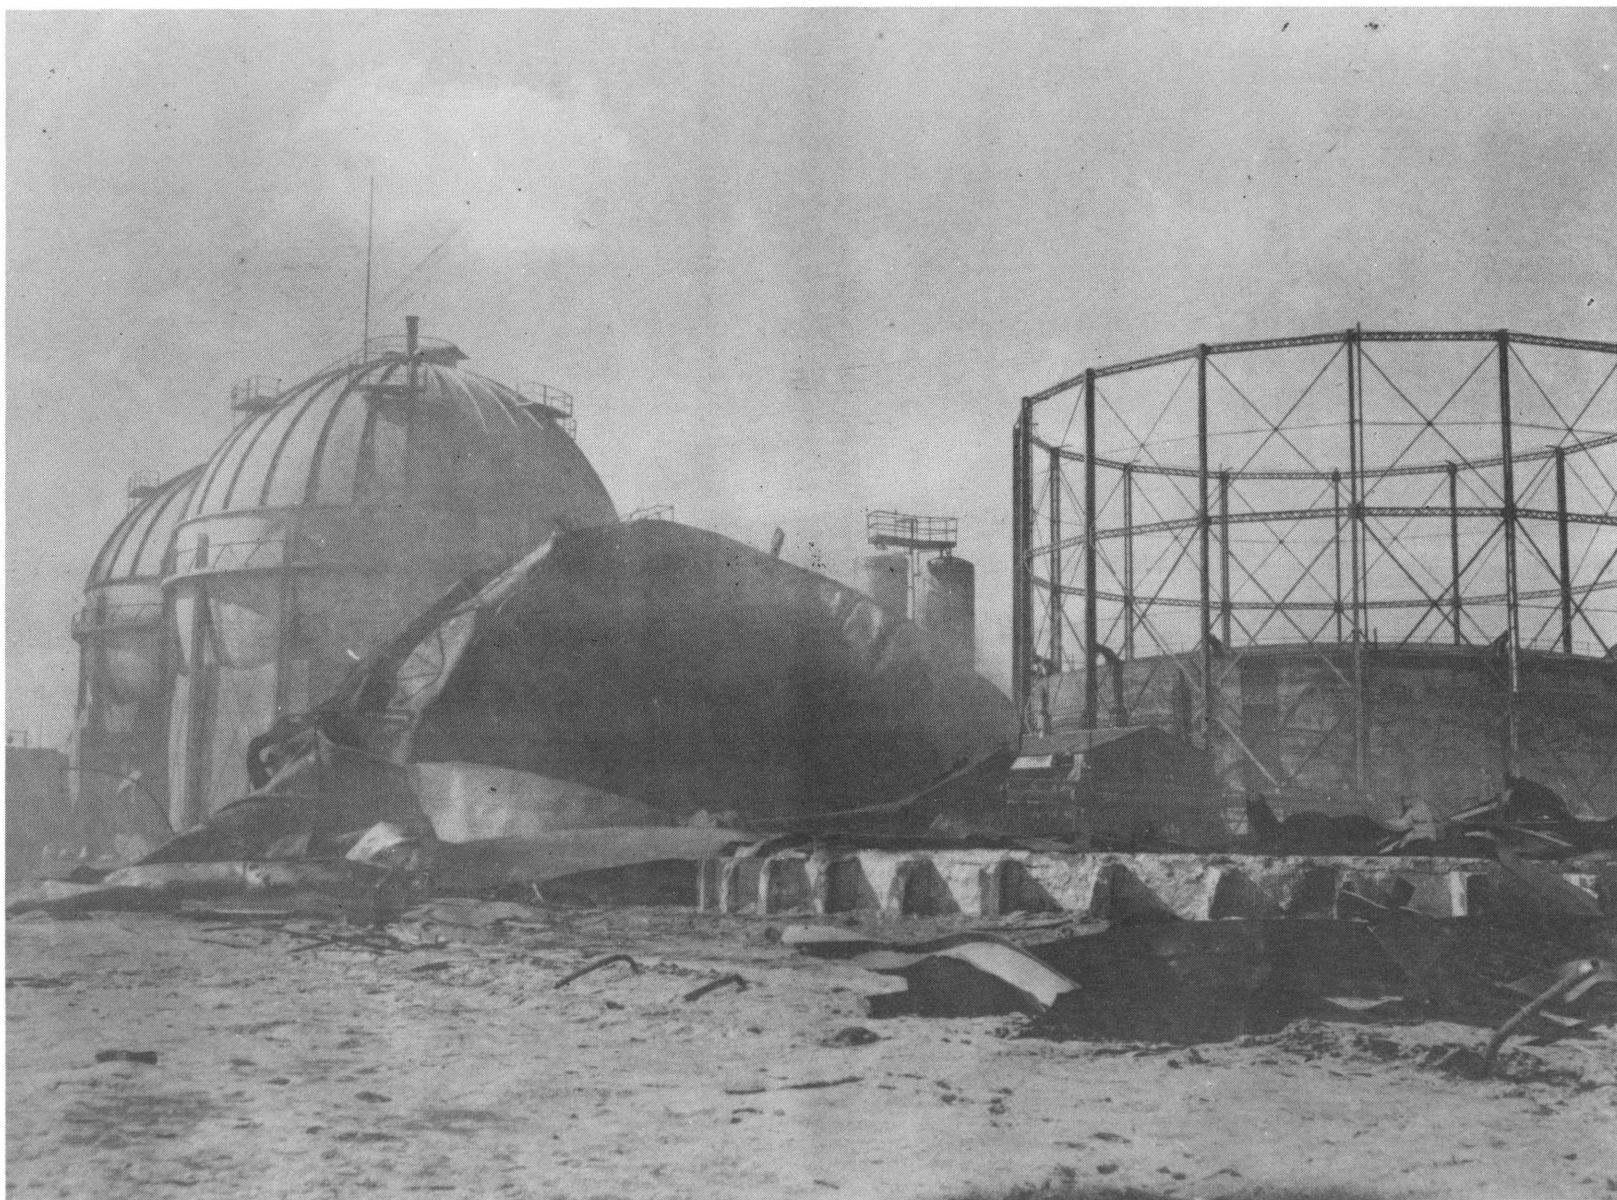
Damage to LS & R plant, East Ohio Gas Co., looking west, showing foundation of tank 4 in the foreground and collapsed spherical tank 3.
